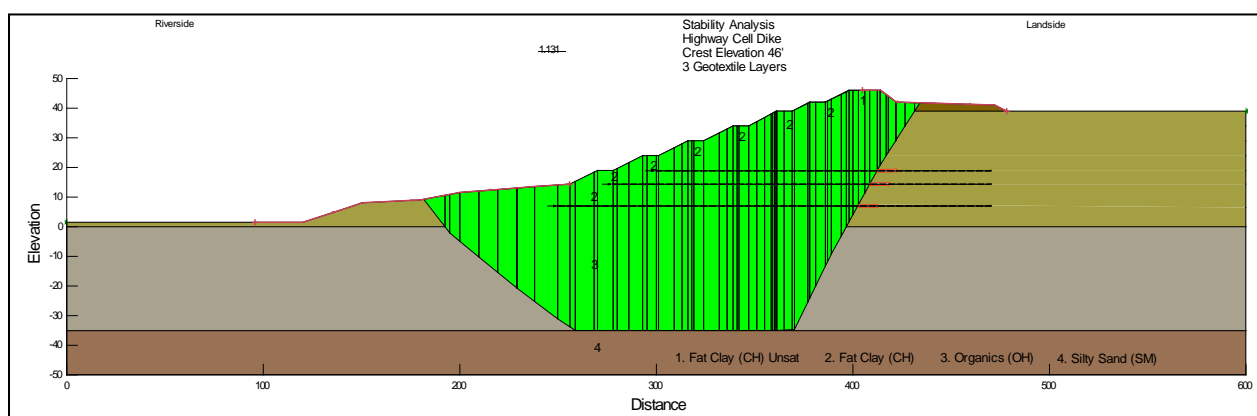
Highway Cell. Elevation 50'. 3 Geotextile layers. FS = 1.131
